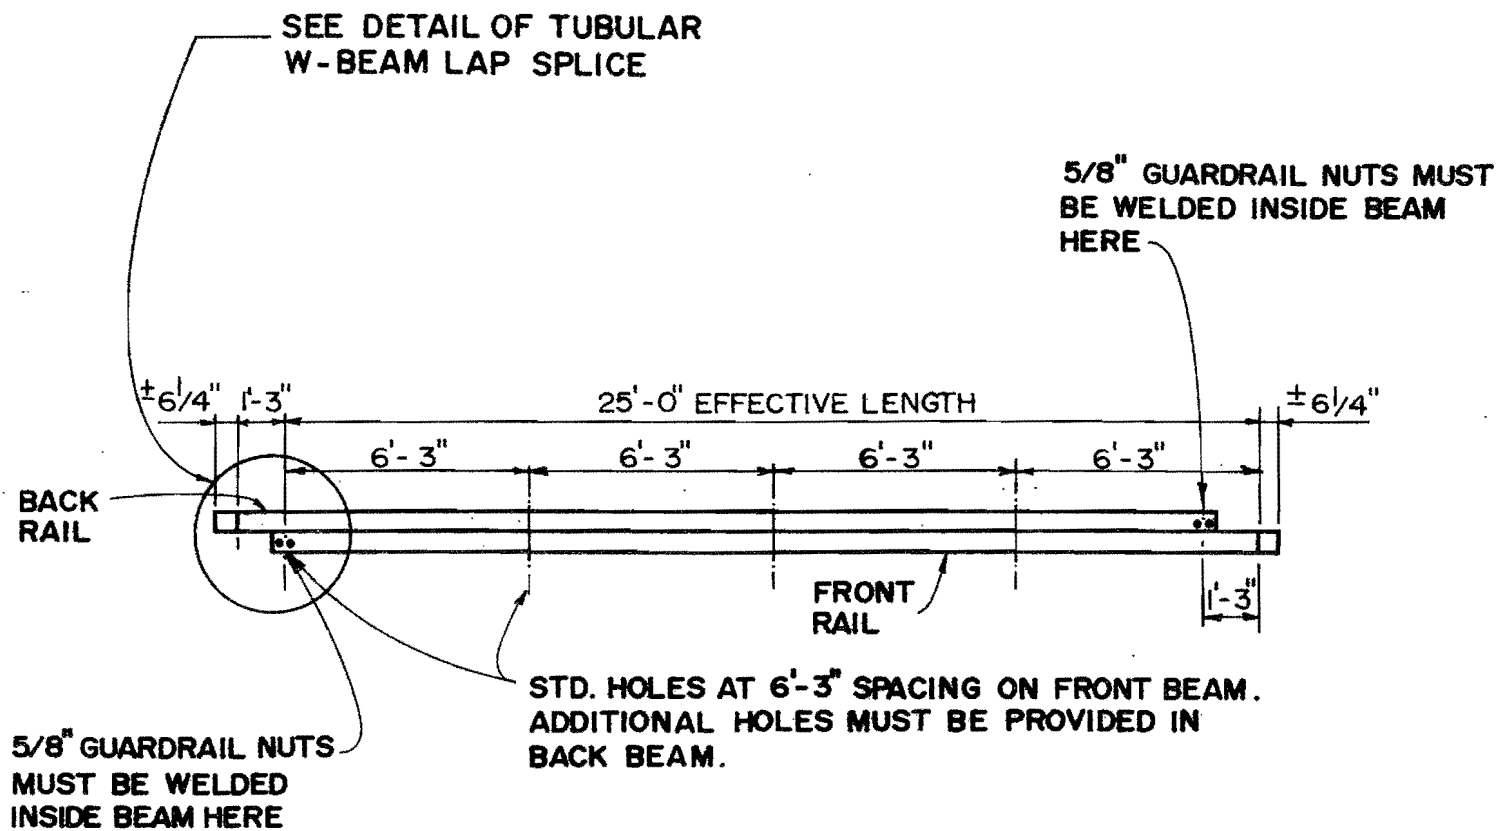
PLAN VIEW OF 25' PIECE TUBULAR W-BEAM MAKE-UP.
